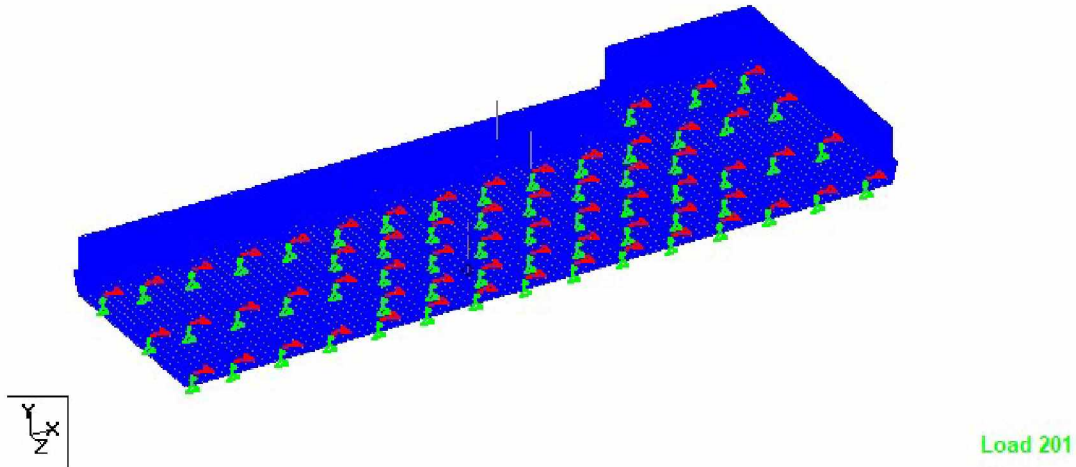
Load due to traffic on pile cap foundation (L/C 201)
